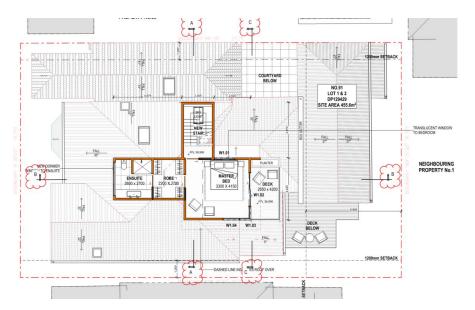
Proposed first floor plan - 91 Beach Street, Coogee
